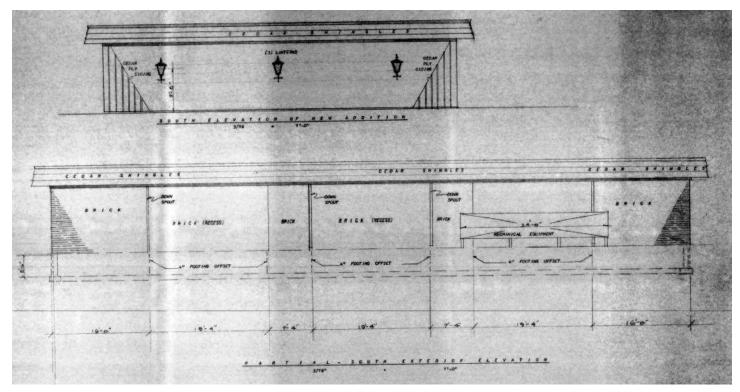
North end and south end elevation sketches, 1971 (Drew McNamara and Associates)
